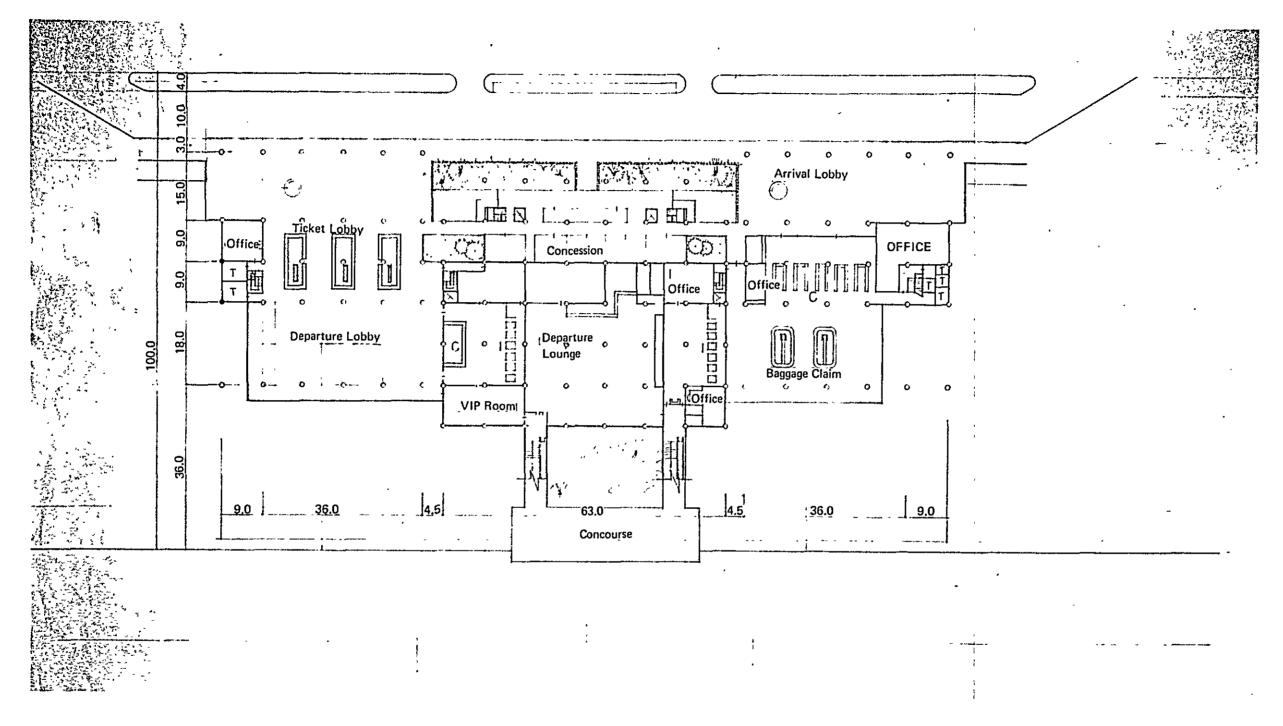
Proposed International Airport Terminal Building 1st Floor Plan
